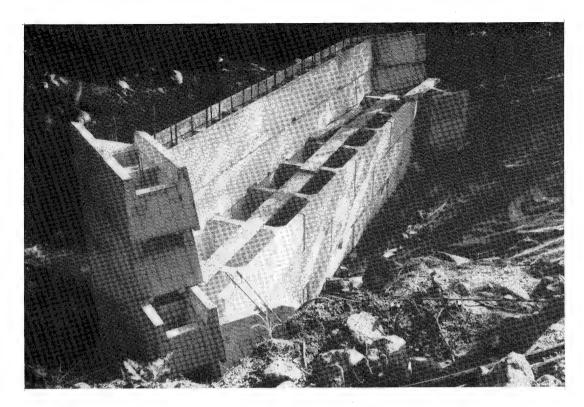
Top view of precast abutment prior to backfilling, Ulsterville Bridge
